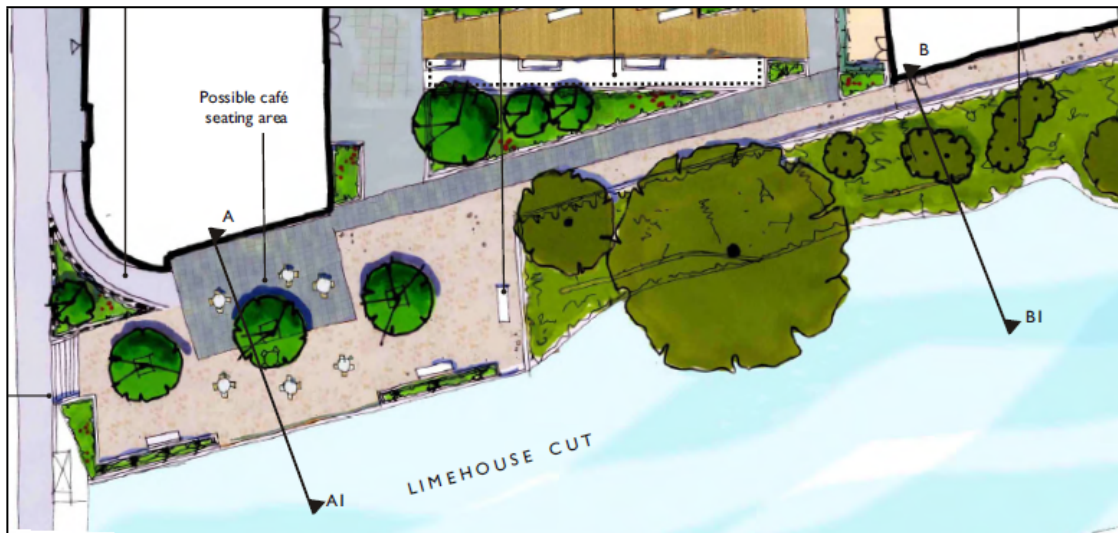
Landscape Plan- Ligurian Walk – Canal side
